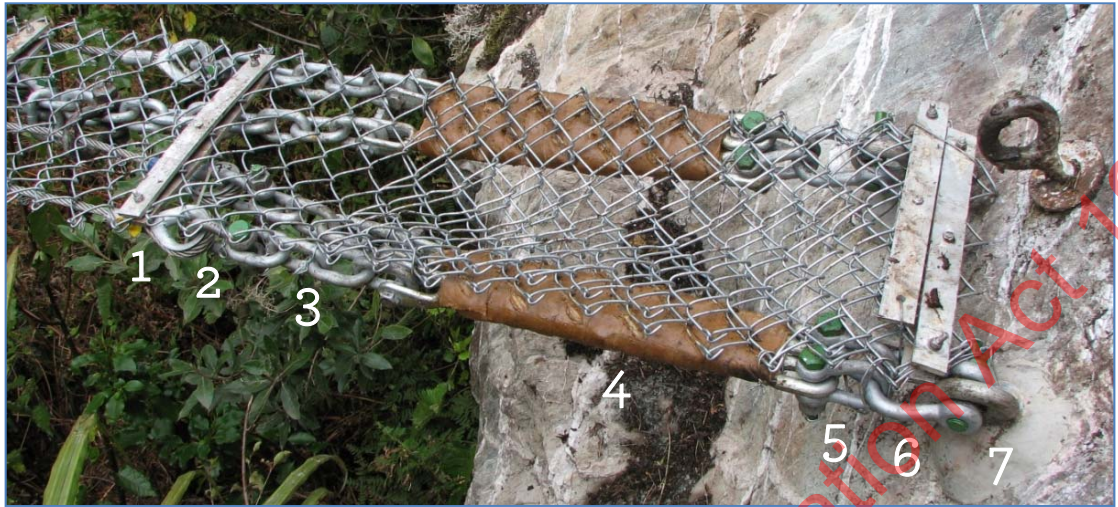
Typical NZFS Swingbridge deck cable terminations and rock anchors
